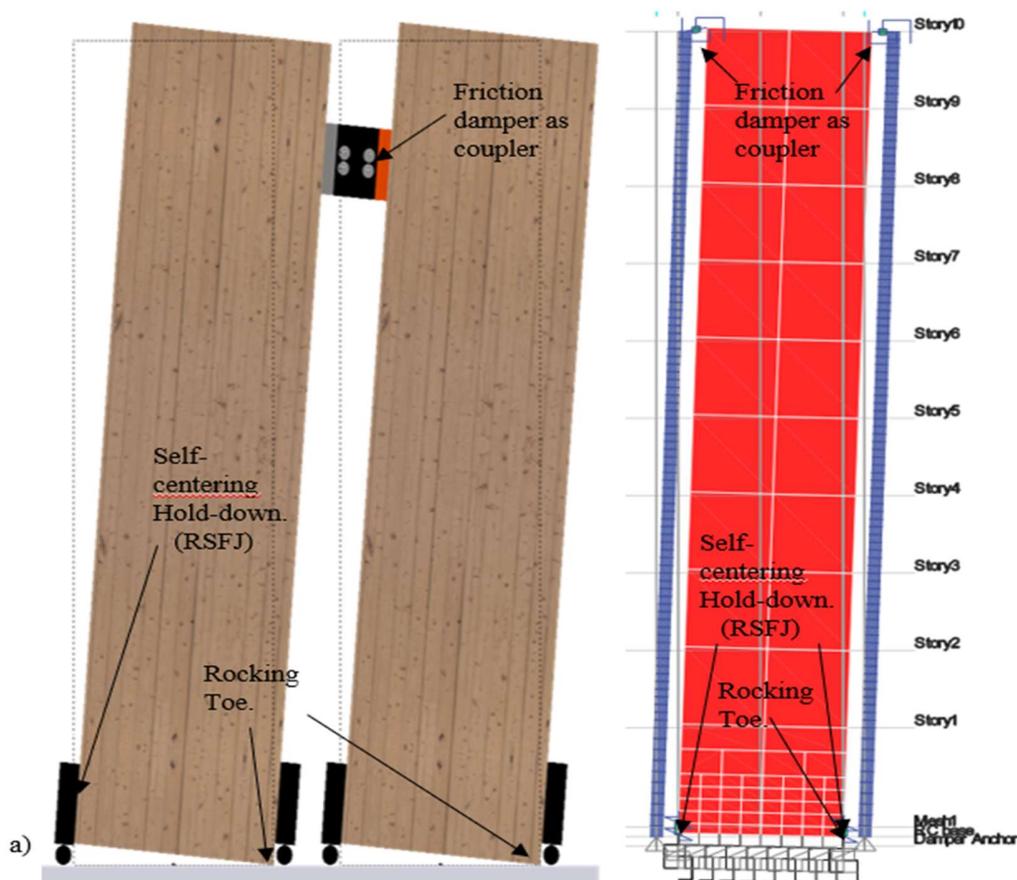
a) Coupled-wall with wall. b) Coupled wall with boundary columns
